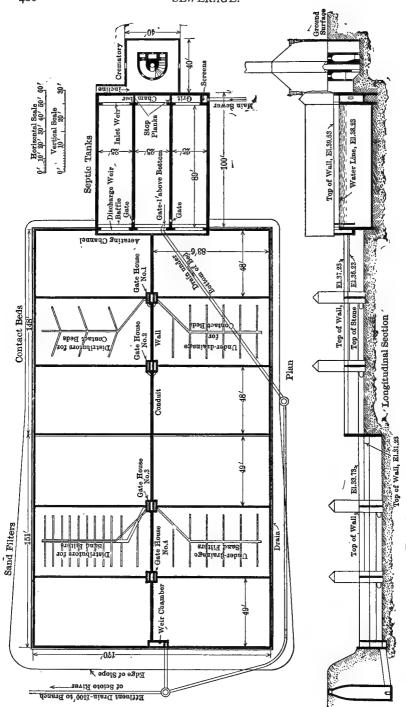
Plan and Longitudinal Section of Sewage-disposal Plant at Marion, O.
